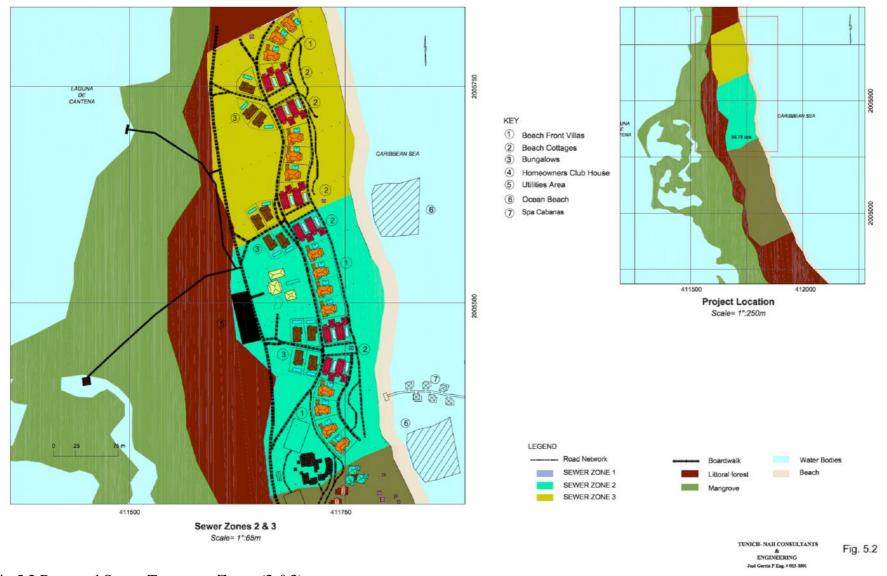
Proposed Sewer Treatment Zones (2 & 3)
